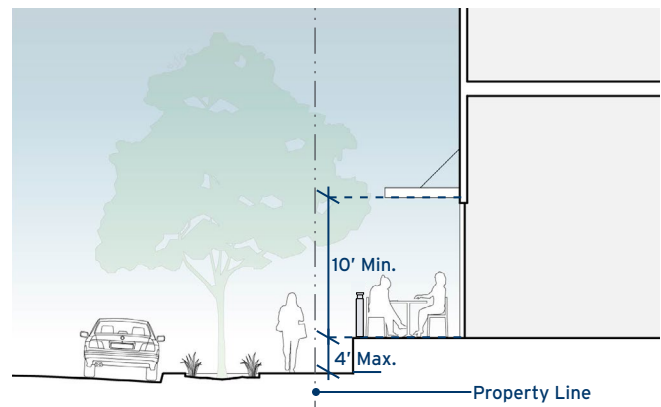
Raised Commercial Terrace Illustrative Section
